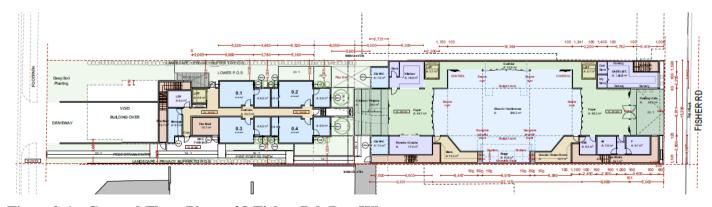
Ground Floor Plan – 28 Fisher Rd, Dee Why
